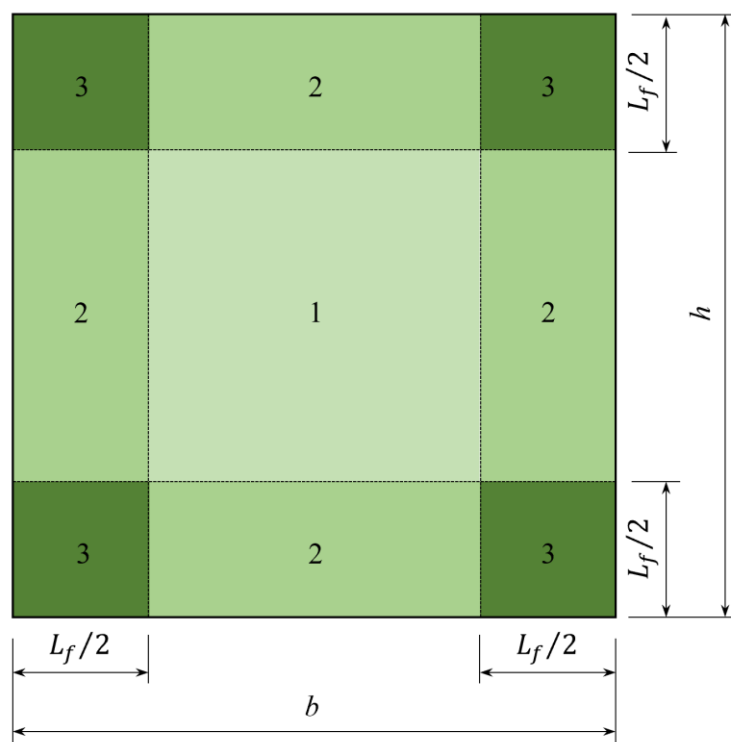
Beam cross section illustrating the different orientation zones (after Dupont and Vandewalle (2005))
